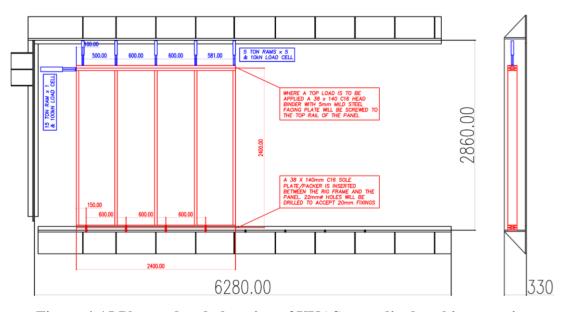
Plan and end-elevation of UKAS accredited racking test rig modified from BS EN 594:2011
